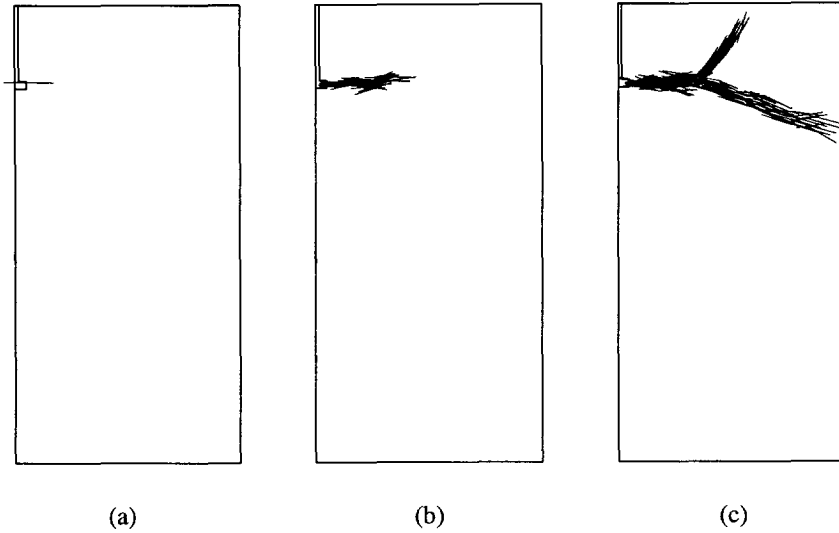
Pullout of an anchor bolt. Active cracks (a) just before maximum load ; (b) just after maximum load ; (c) final crack pattern
